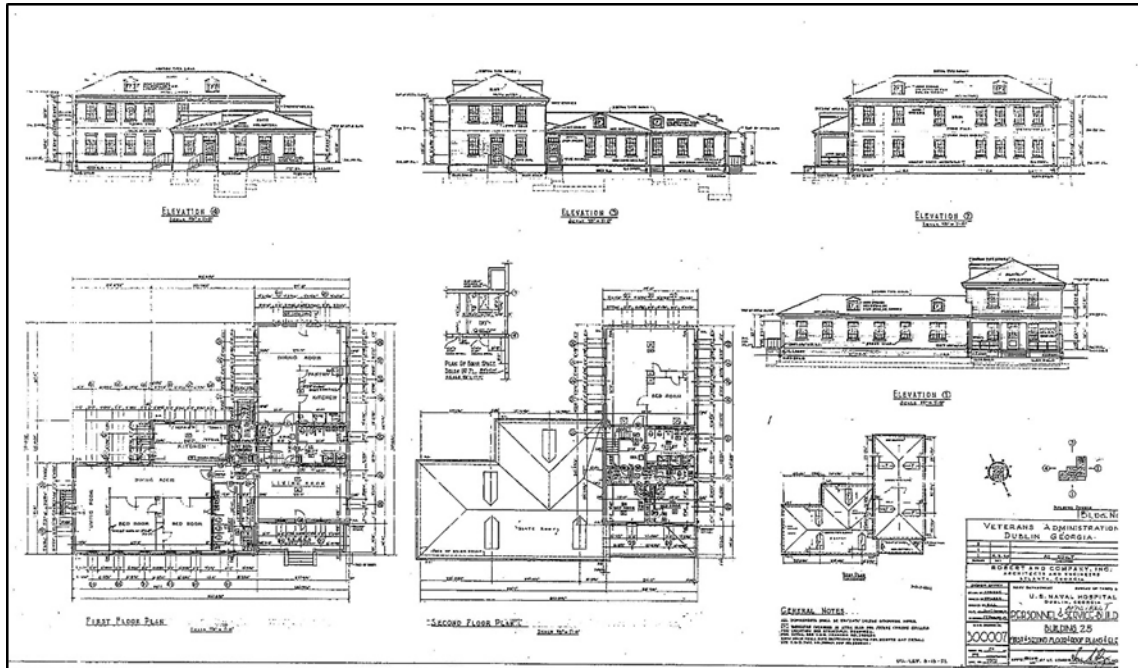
Architectural drawing showing Building No. 25 in plan and elevation (VA).
